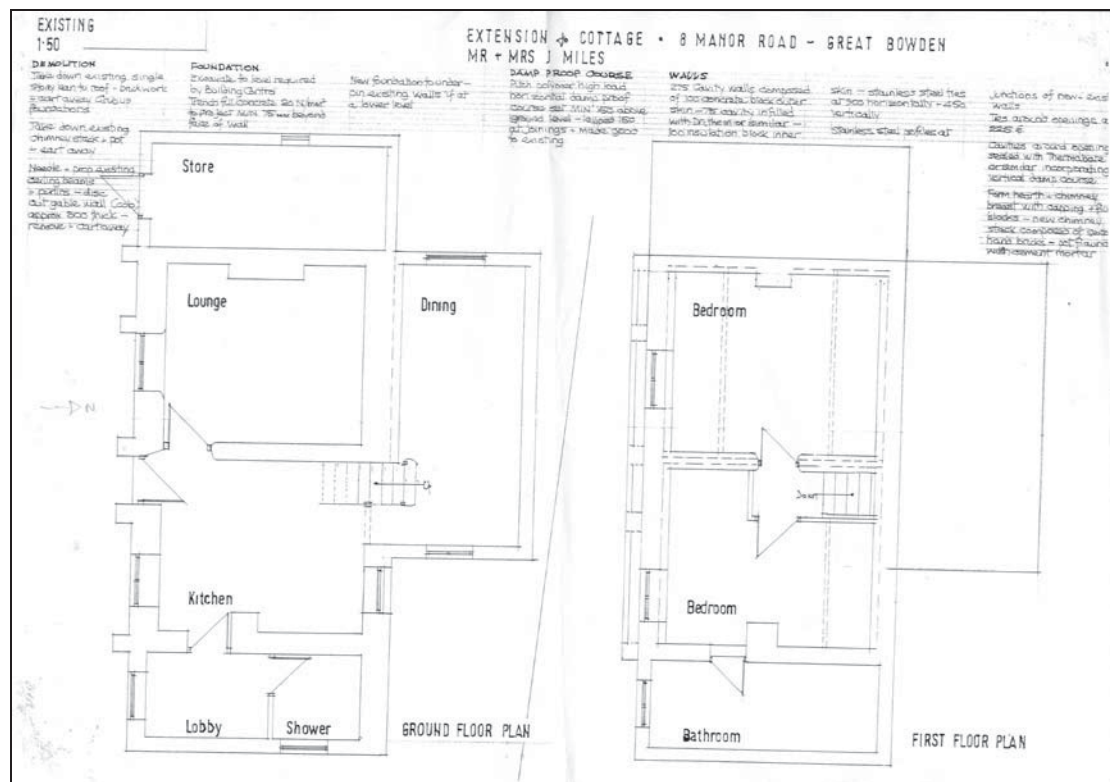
Scan of existing floor plans of 8 Manor Road, Great Bowden (plans provided by the client). North is to the right of the illustration.
